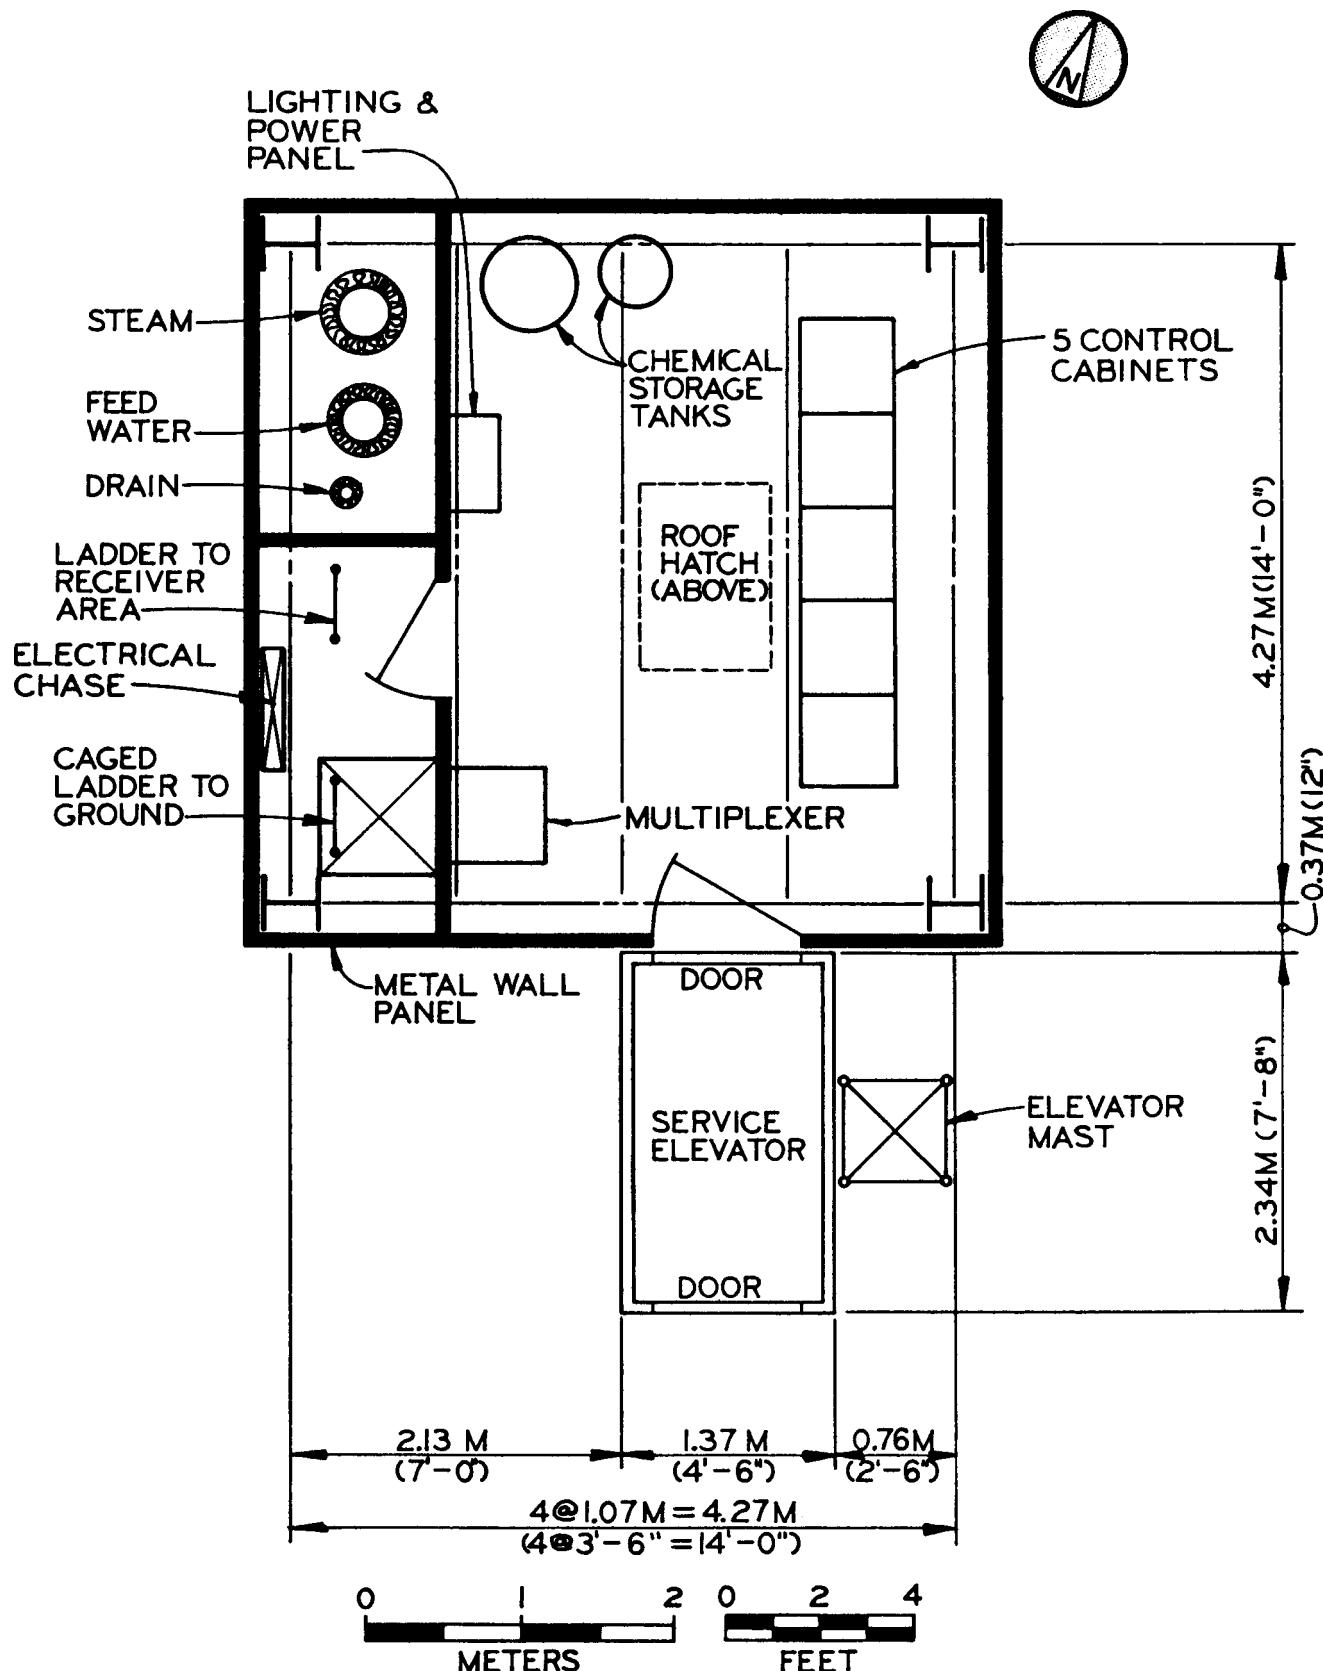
RECEIVER TOWER EQUIPMENT ROOM FLOOR PLAN
